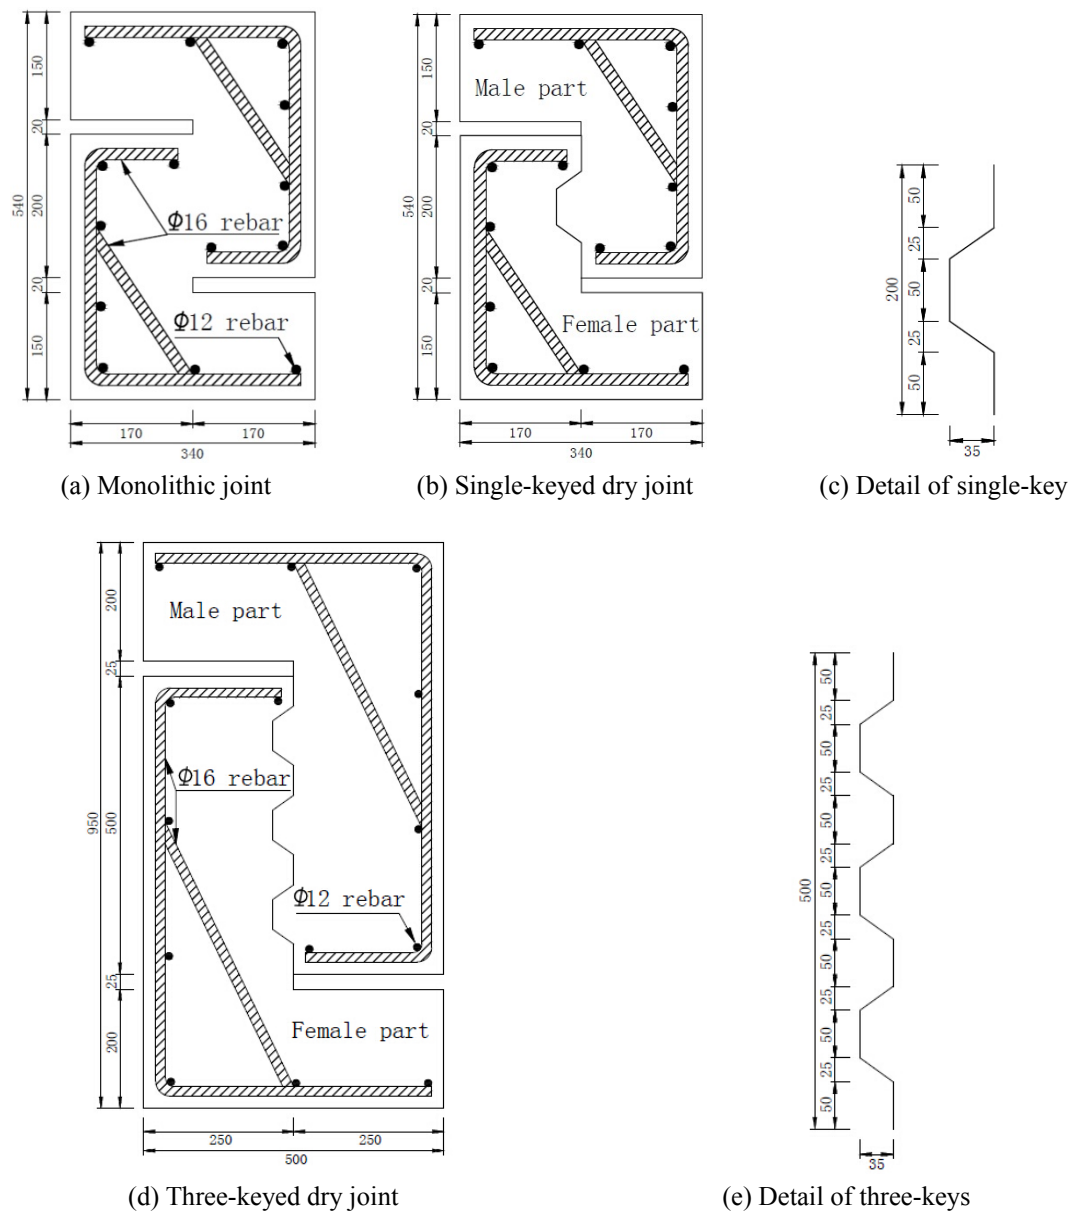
Specimen dimensions and configurations for test specimens (mm)
